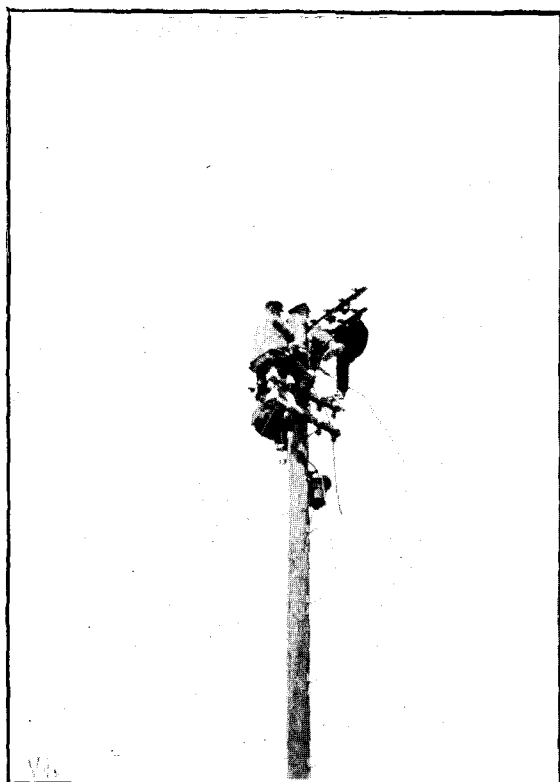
Testing of Circuit, and Plumbing after Coil Jointed in.
